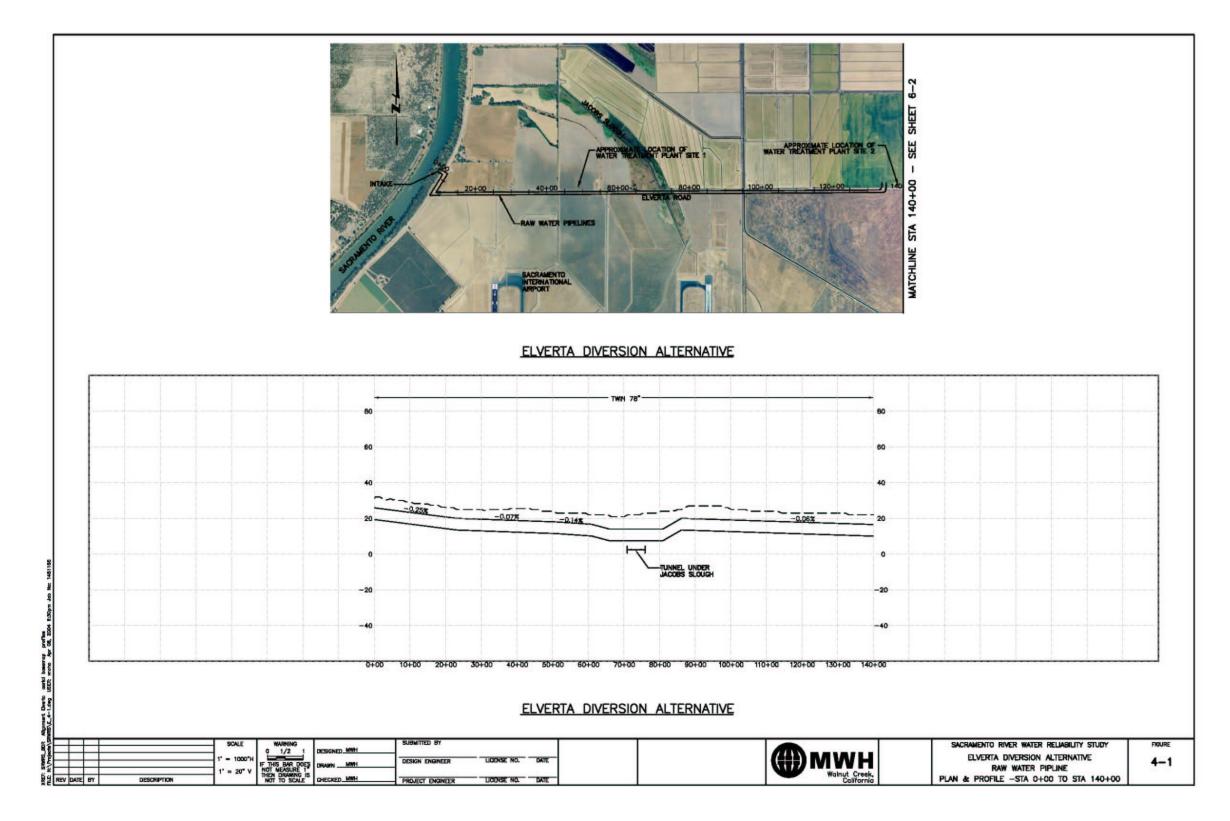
SRWRS Elverta Diversion Alternative Raw Water Pipeline Plan & Profile – STA 0+00 to STA 140+00
